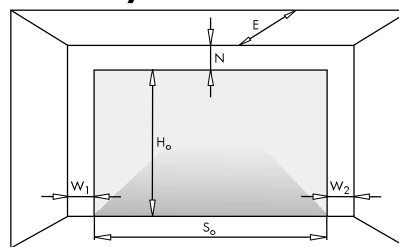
The assembly dimensions and their designation required for correct selection and assembly of up and over garage doors.
